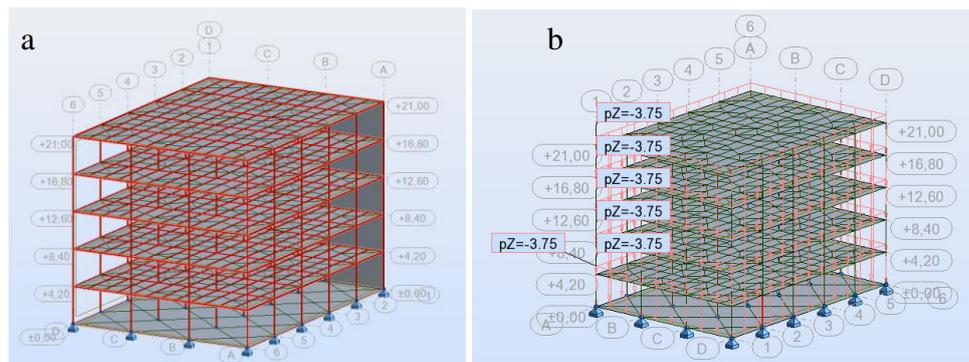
(a) Analytical model of a reinforced concrete frame in Robot;
